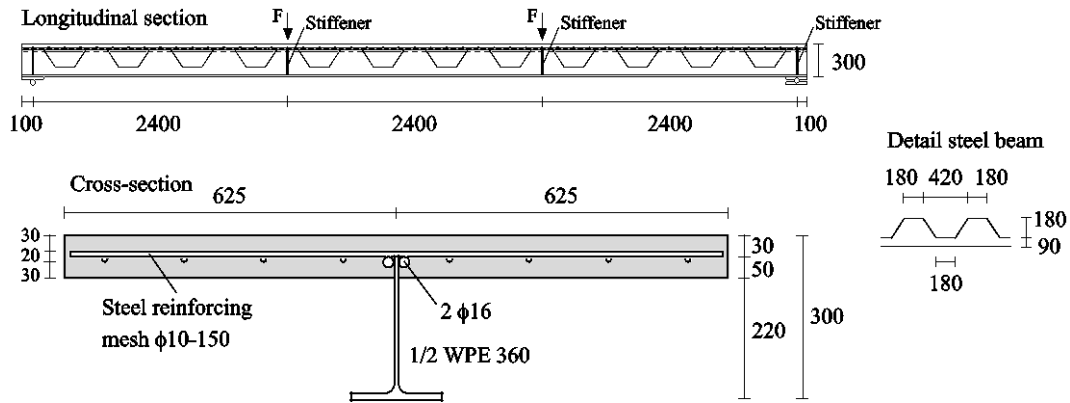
Steel-concrete composite beam with concrete slab on top (“beam I”)
